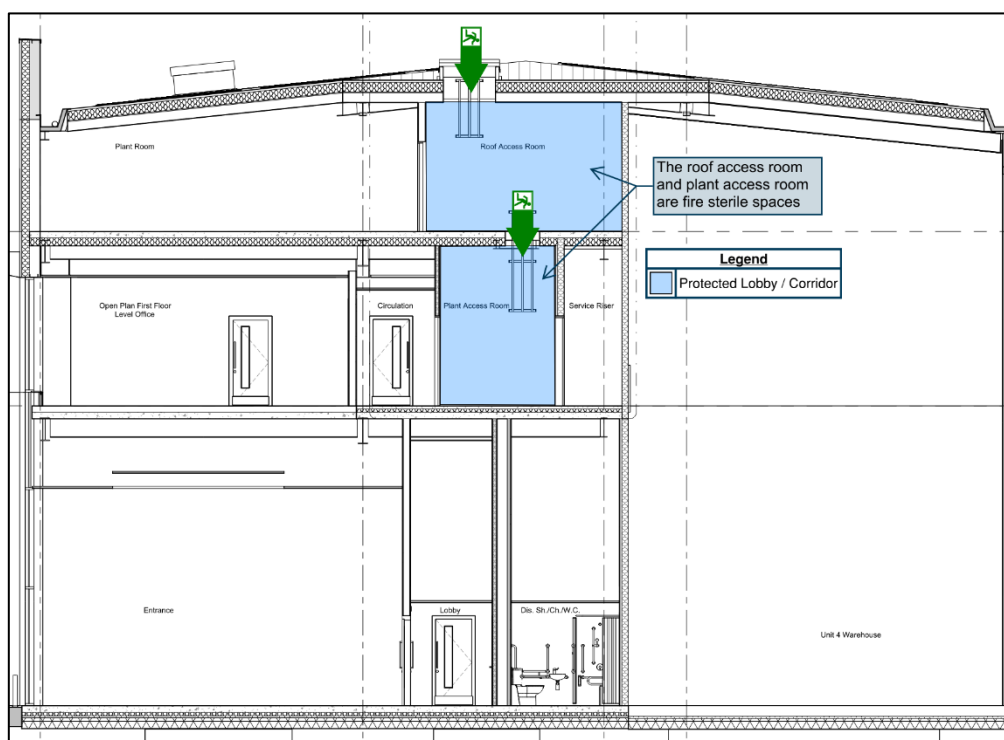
Escape from Roof and Plant Deck Levels (Unit 4)
